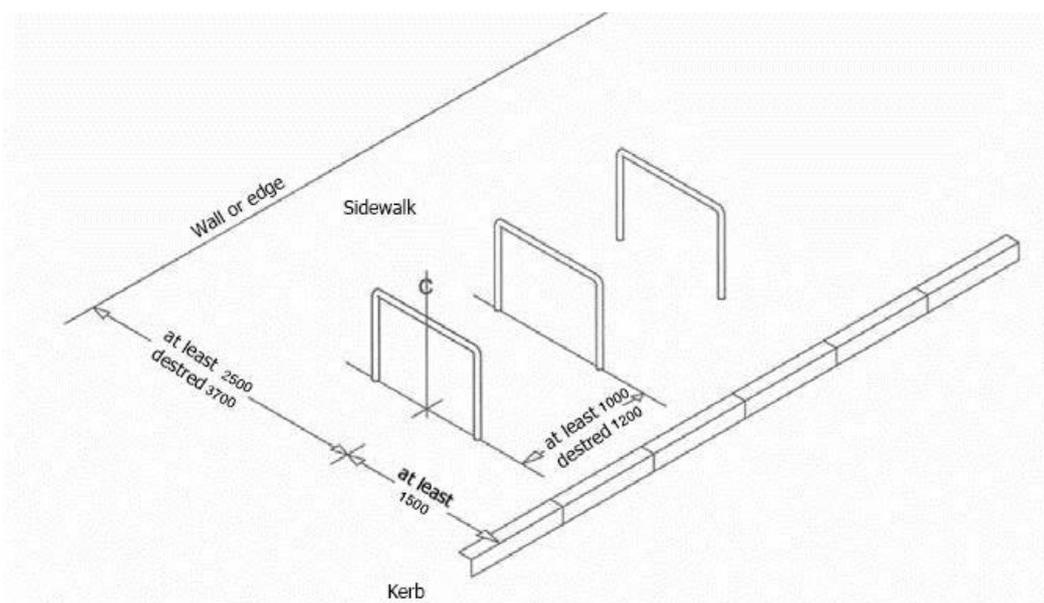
U-shaped rack located at 90 degrees to sidewalk and road
